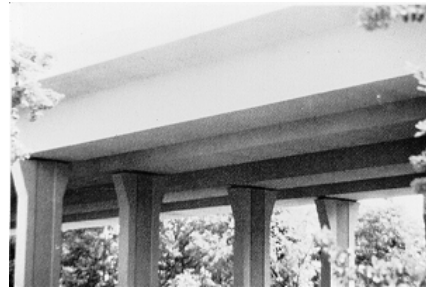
Individual columns supporting individual trapezoidal box girders
